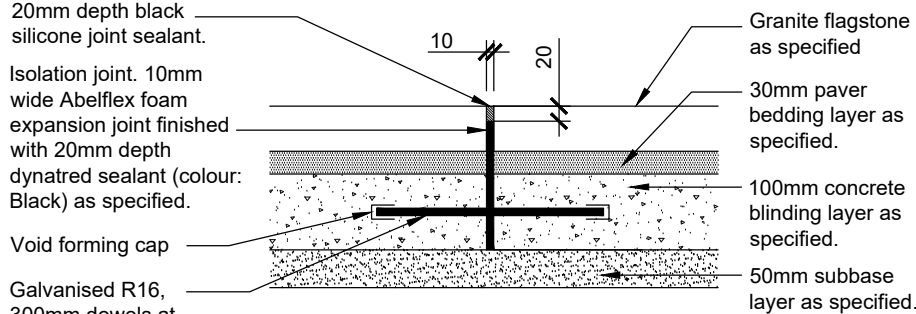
Typical Joint Layout on Crossing - Full Granite Treatment
